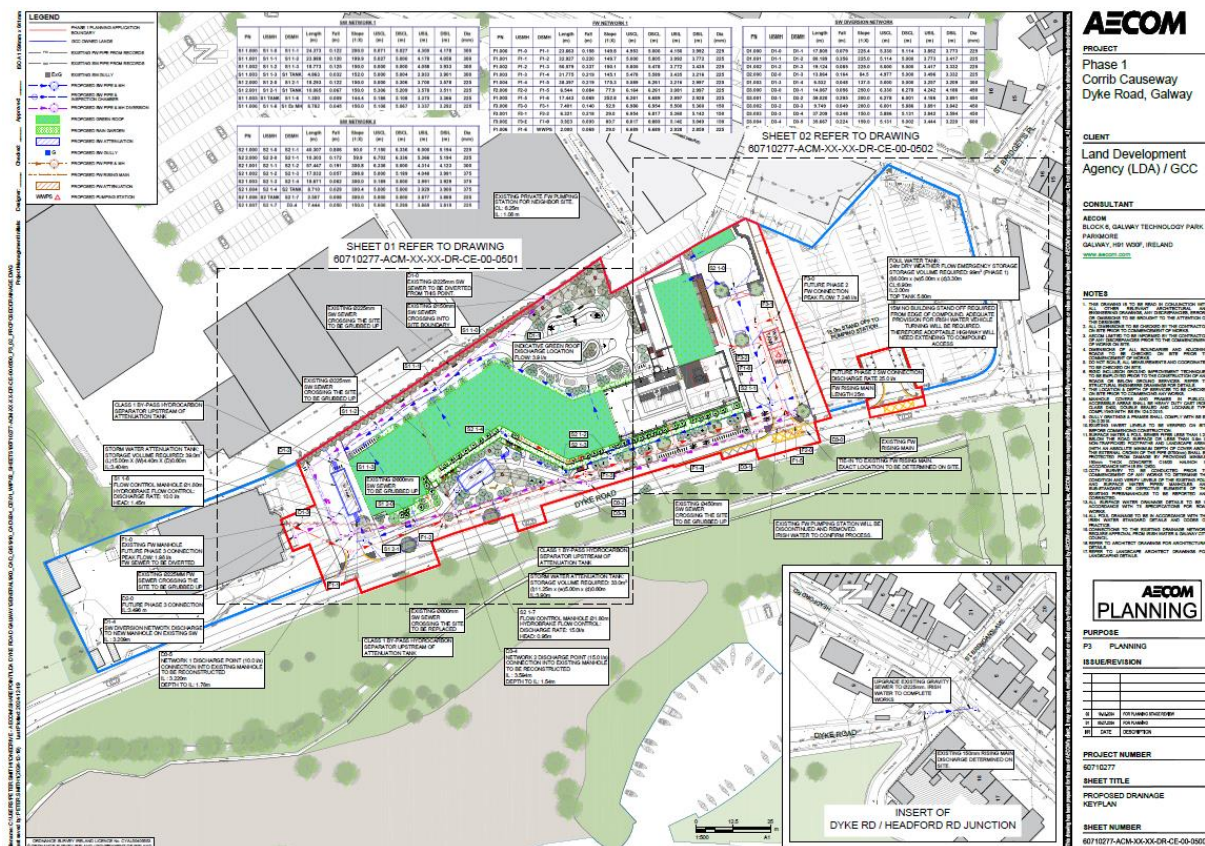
Proposed Drainage Layout (AECOM, 2025a)
